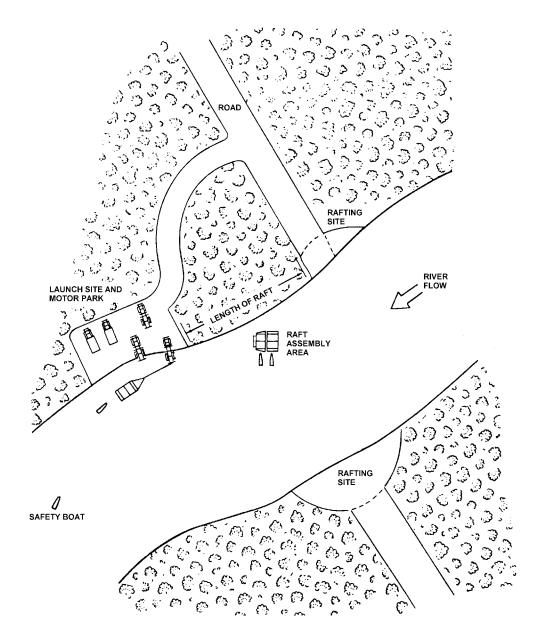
Raft Assembly Layout (Successive Bay Assembly).
